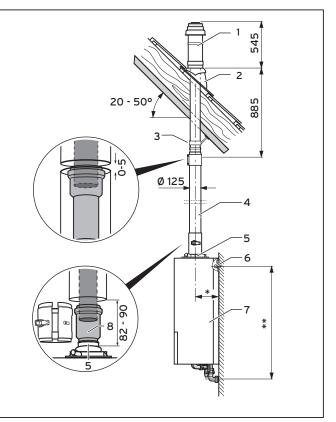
Fitting the appliance and the vertical roof duct to a building with a pitched roof
